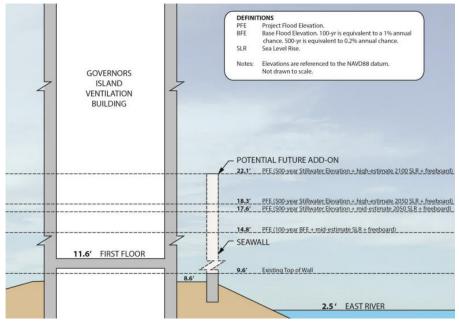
PROJECT FLOOD ELEVATION DIAGRAM.
